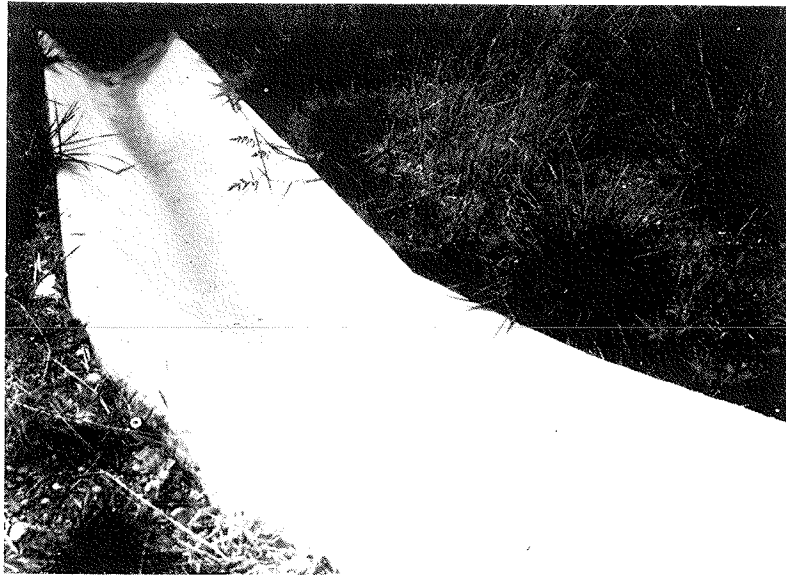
A paved sluice, such as this, is a stable outlet for a ditch. The lining protects the slope from erosion.
